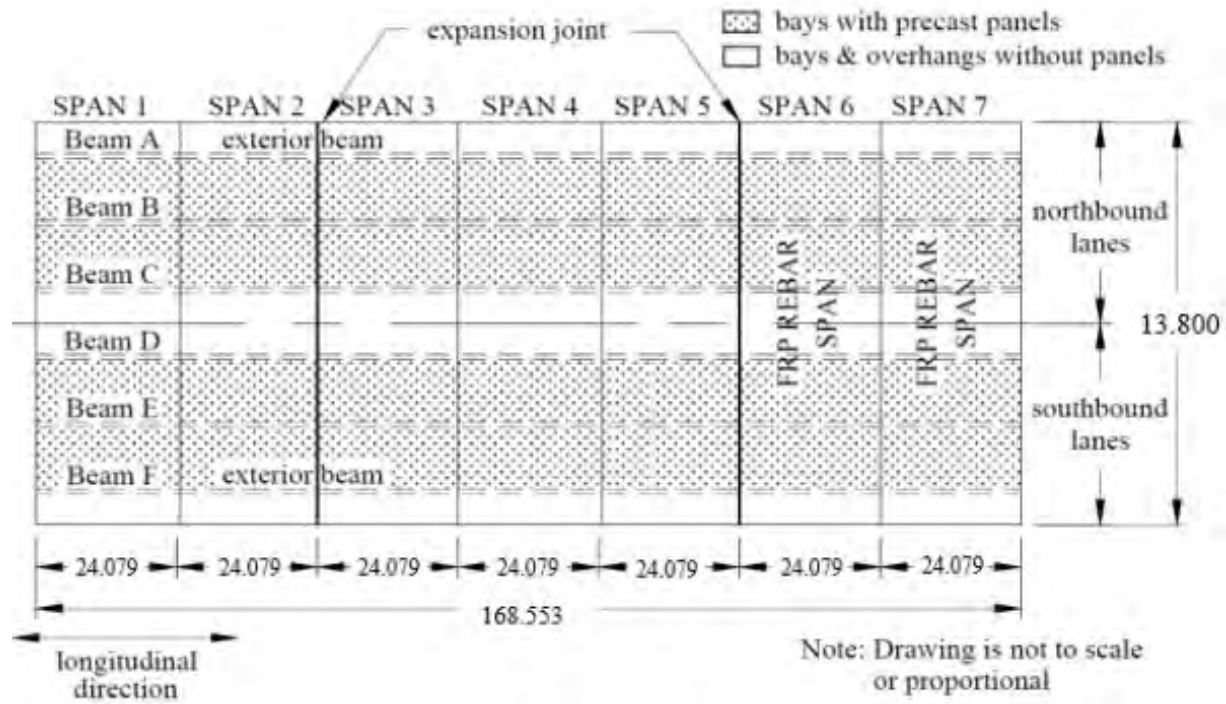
Sierrita de la Cruz Creek Bridge plan view
